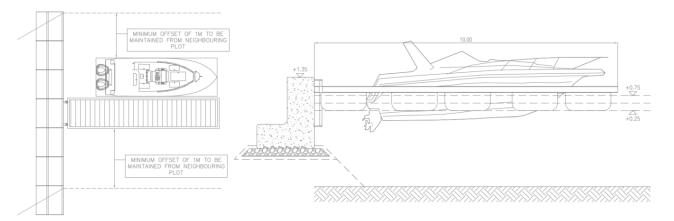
Perpendicular Berthing – Anchored Deck Arrangement
